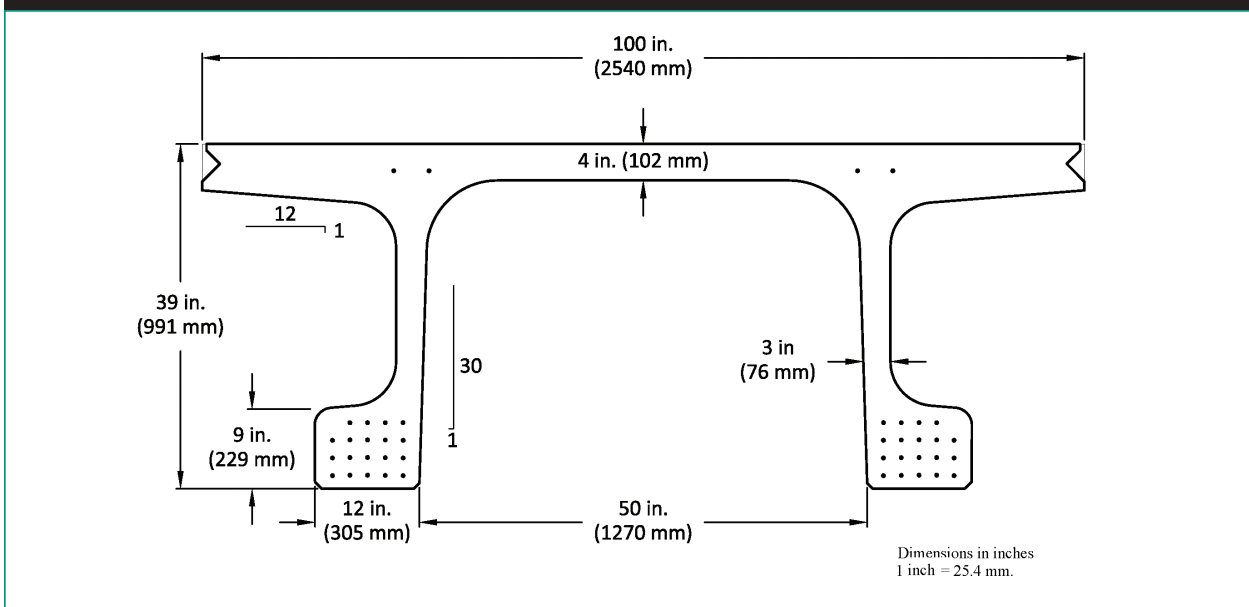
Strand layout of 39-inch (991-mm)-deep section for 95-ft (29-m)-span.
